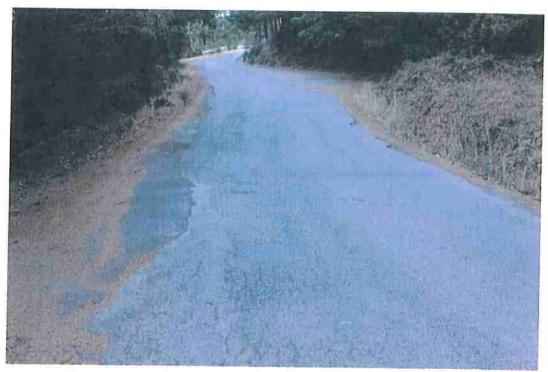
Mile 2.9: 18-ft road width with 1-ft shoulders.
